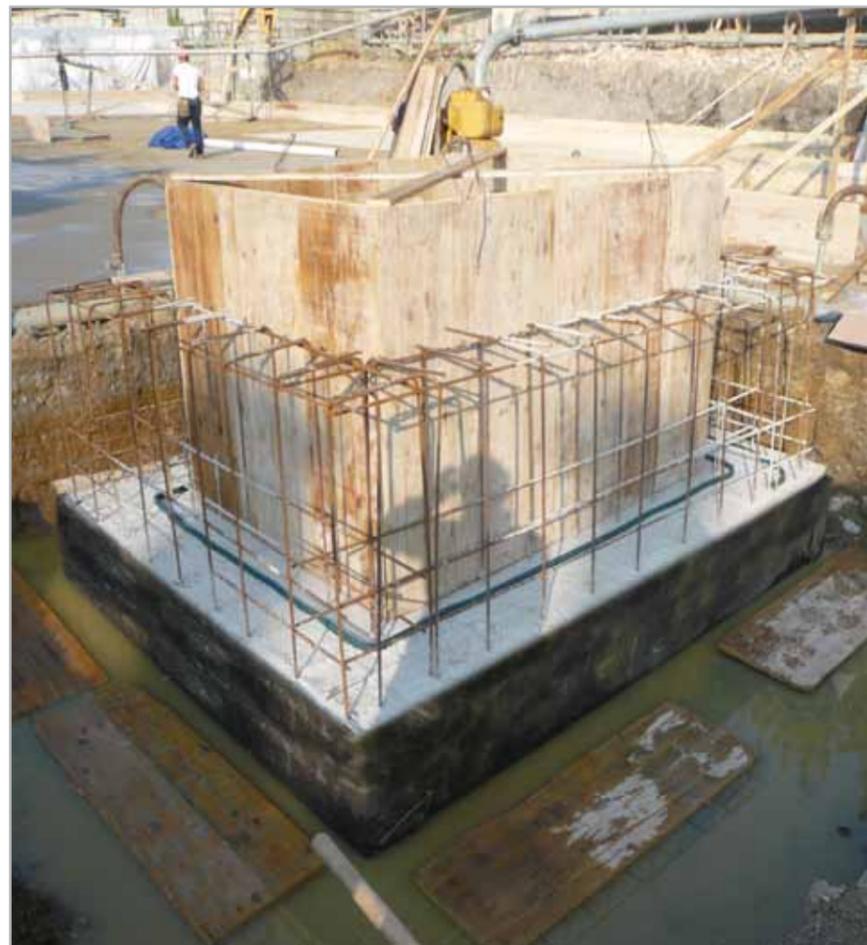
Waterproofing a lift well built in a stripped-type excavation
